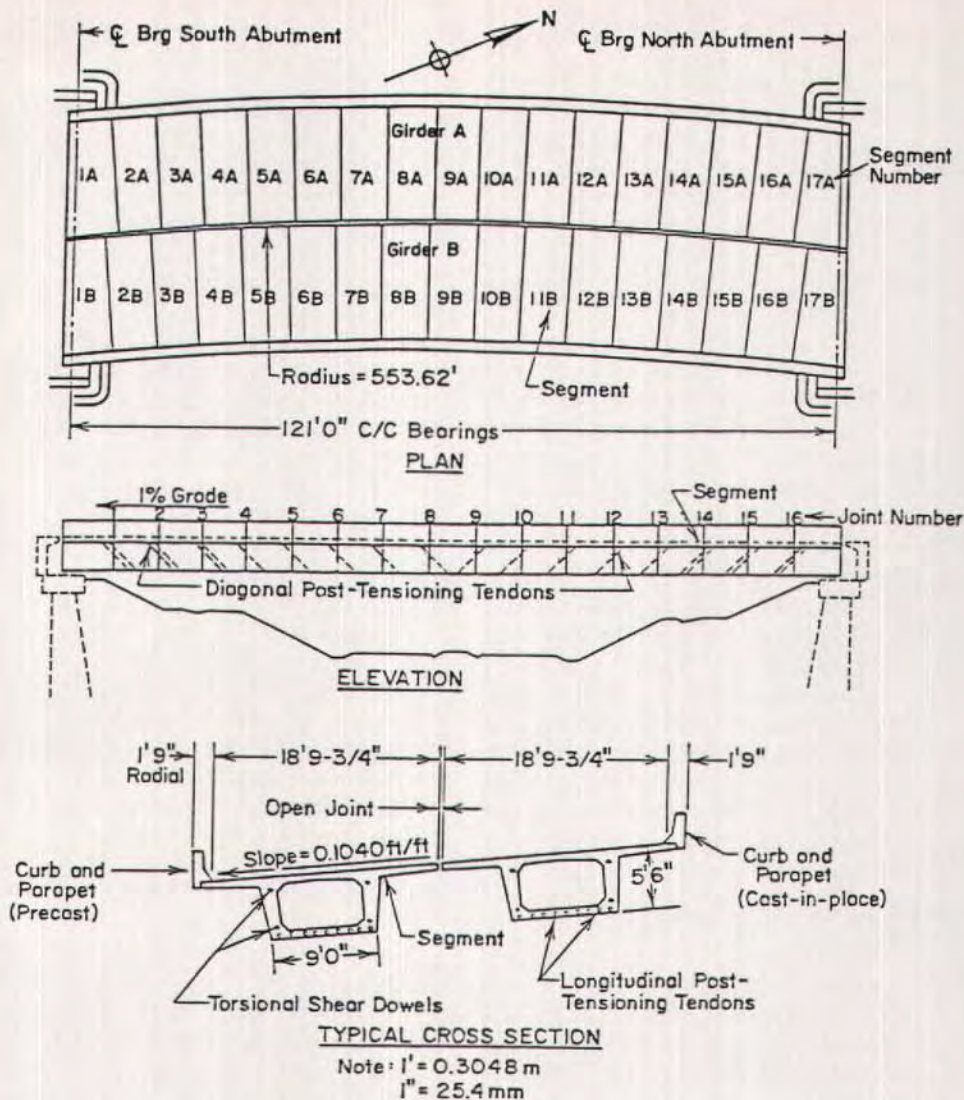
General plan, elevation and typical section of an experimental segmental bridge.
